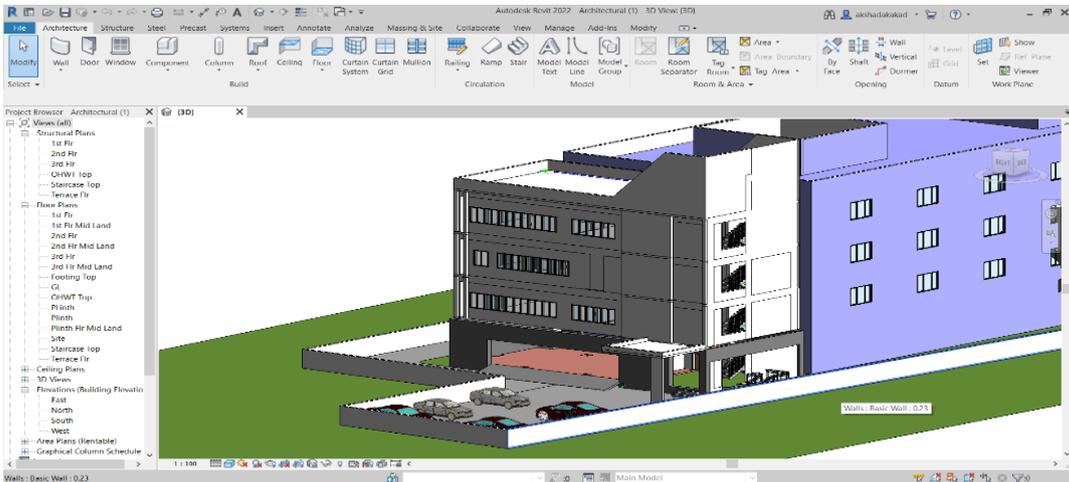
Schematic of REVIT Architectural Model of G+3 Building
